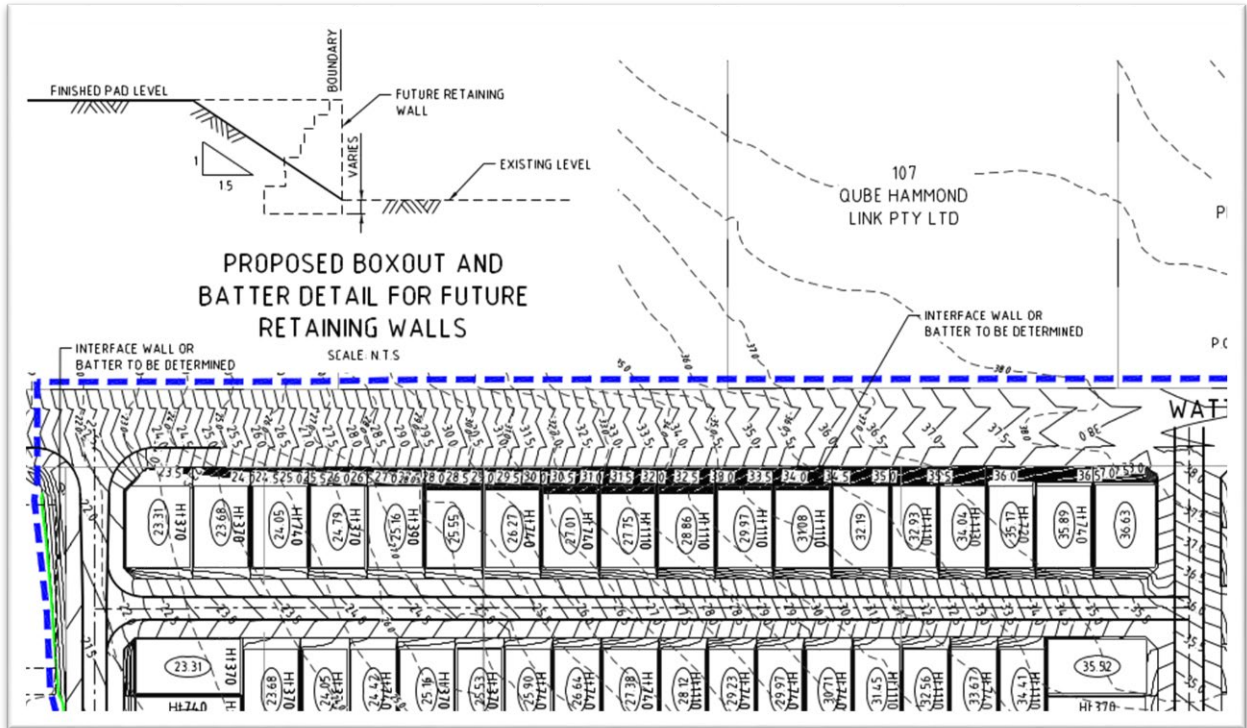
Preliminary Earthworks Plan Extract – Lots Adjacent to Wattleup Road between Access Road 1 and 2
